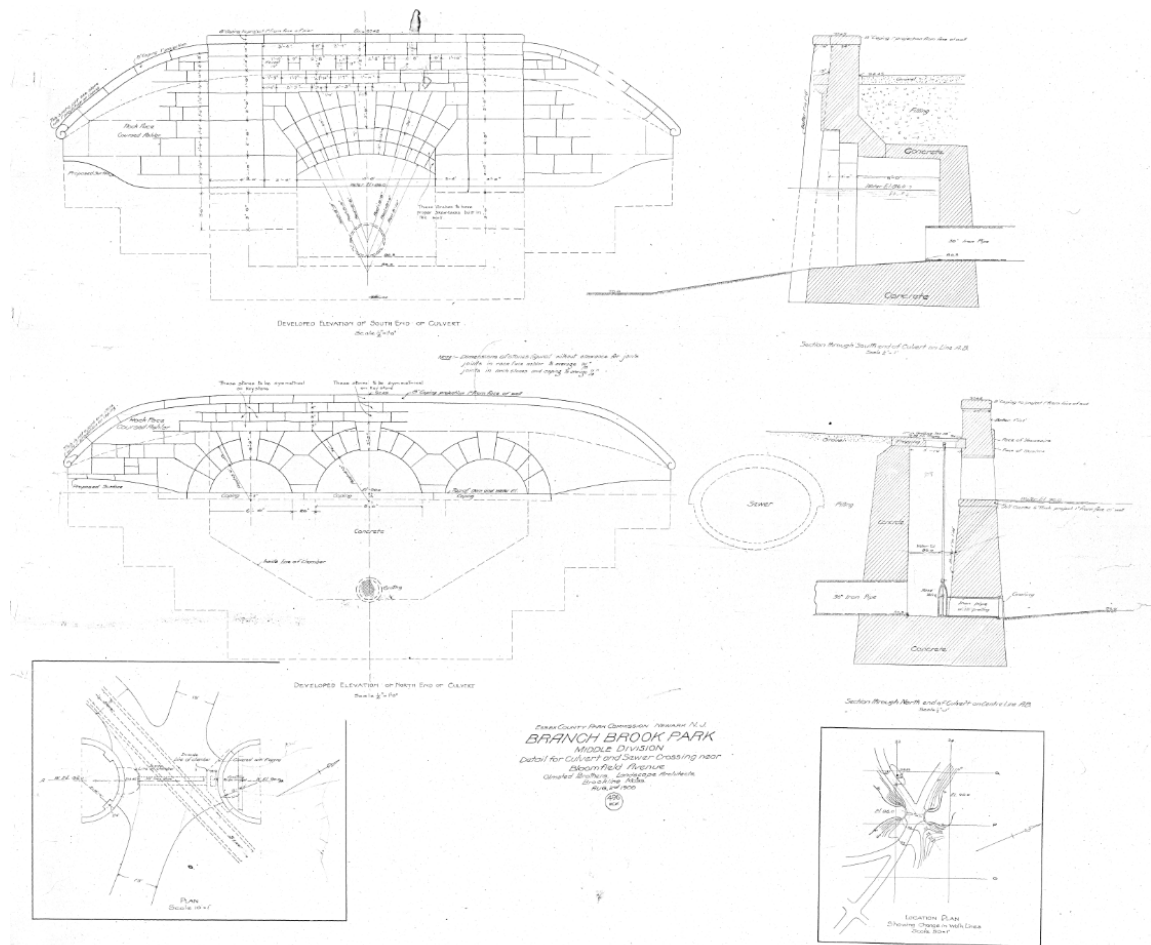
Branch Brook Park Middle Division Detail for Culvert and Sewer Crossing near Bloomfield Avenue. Image Credit: Archives of the Essex County Park System.
